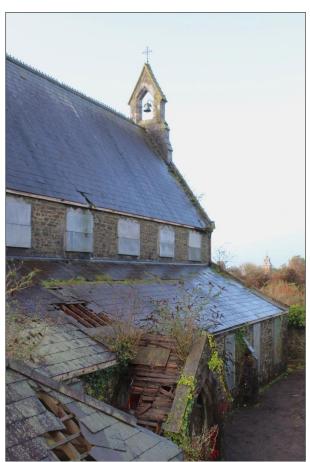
View to west across northern elevation of former chapel with gabled rear entrance porch in foreground.
